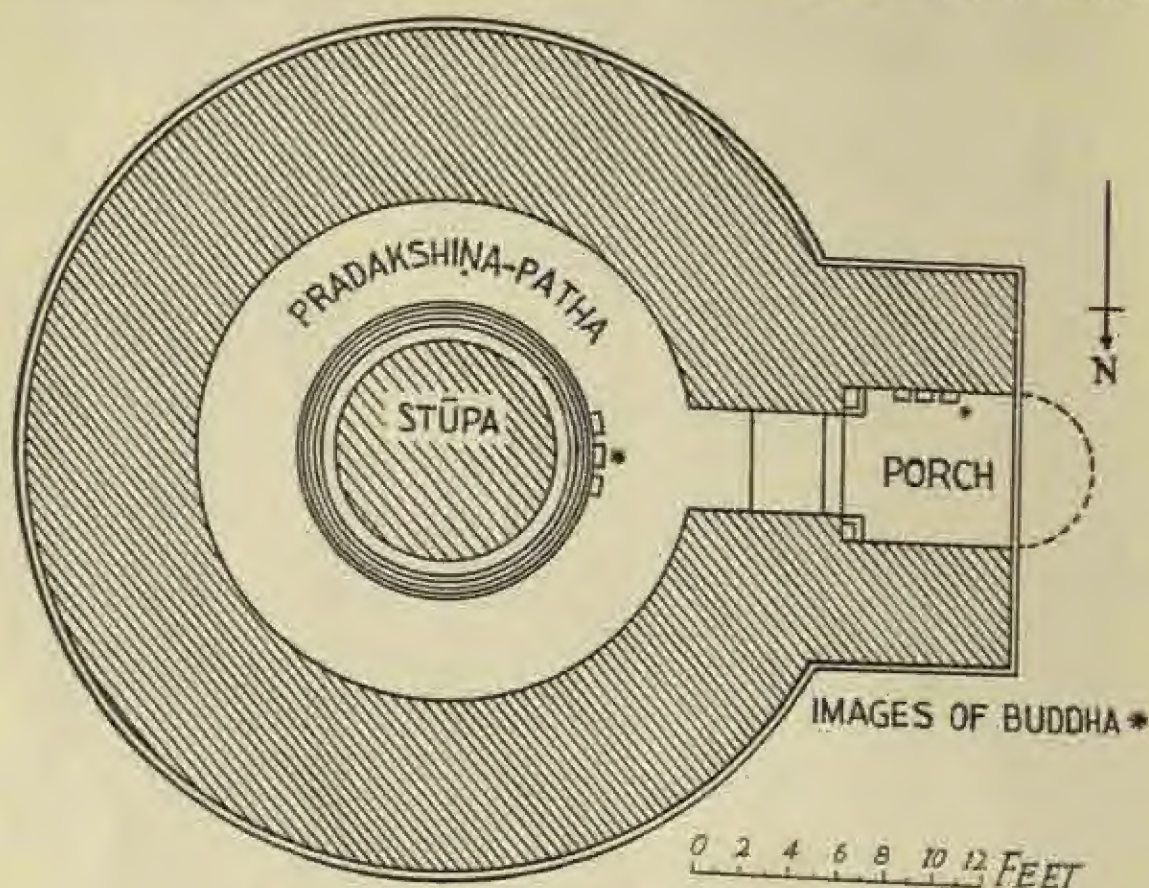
Guntupalli : structural *chaitya-griha*, plan
